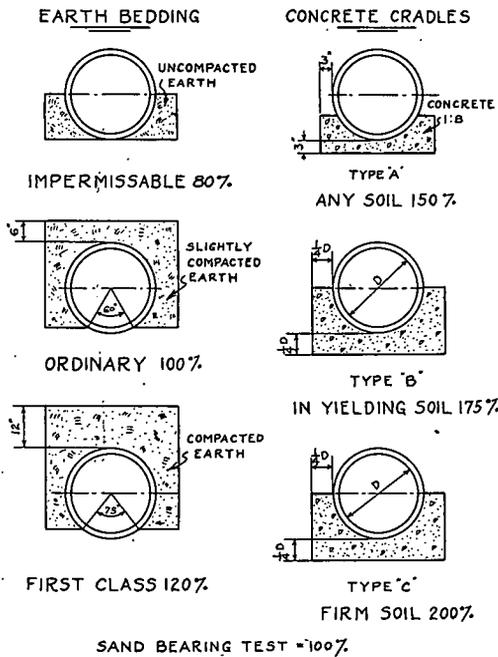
CLASSIFICATIONS OF PIPE LAYING IN TRENCHES
